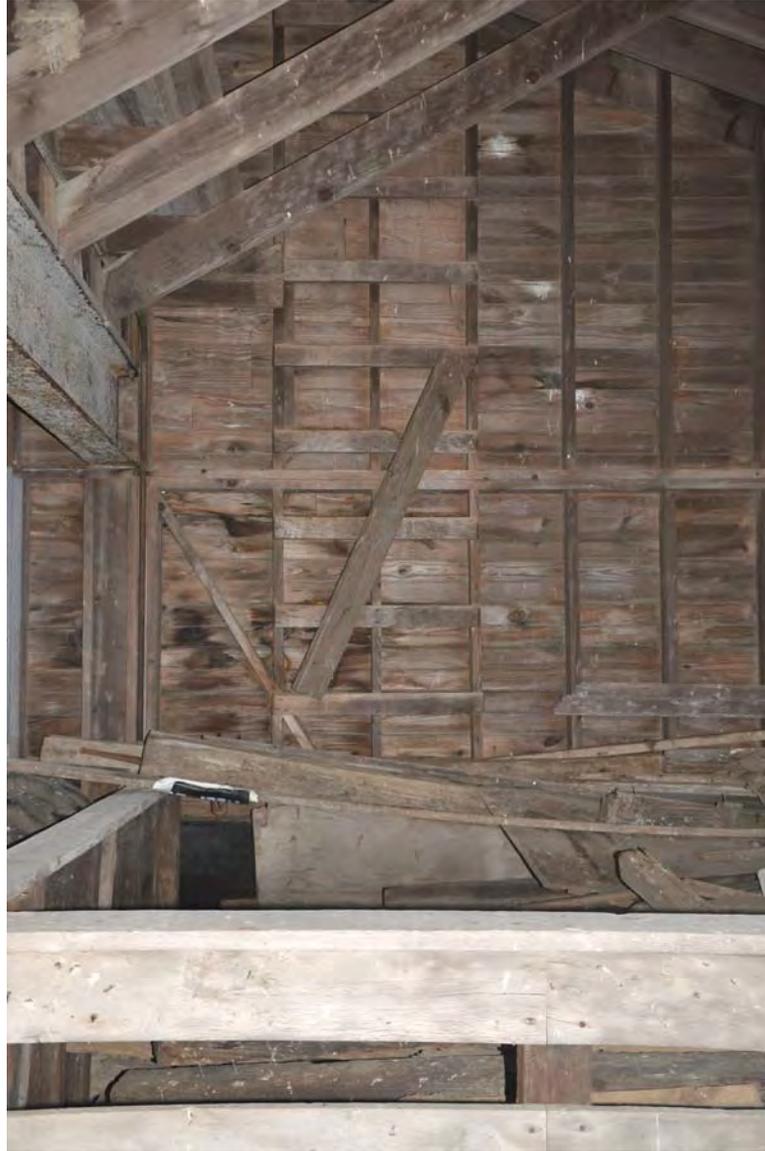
Barn. Detail of interior ladder on northeast wall (above interior pen); view looking northeast.
